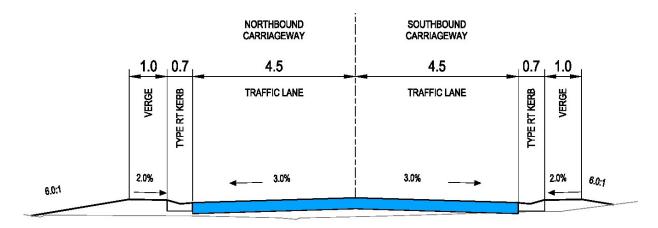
Typical cross section - Denmark Road, Carlton Street, Trevithick Street
